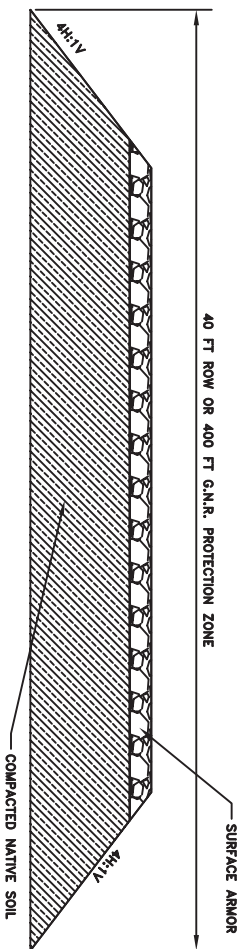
F BERM DETAILS LANDFARM #4 PERMIT
